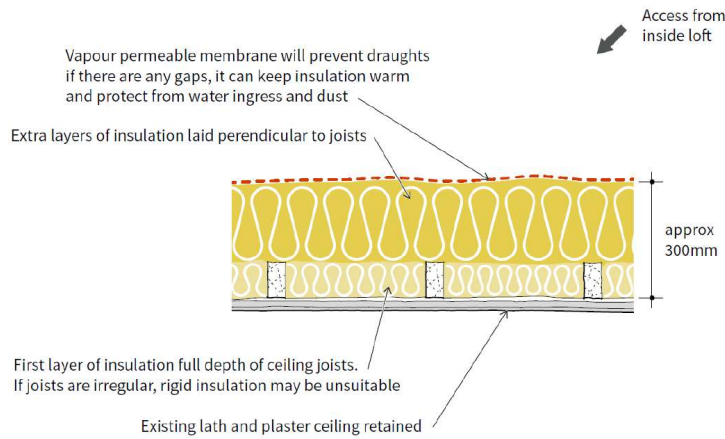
3rd Solution Horizontal Roof composition (21)
